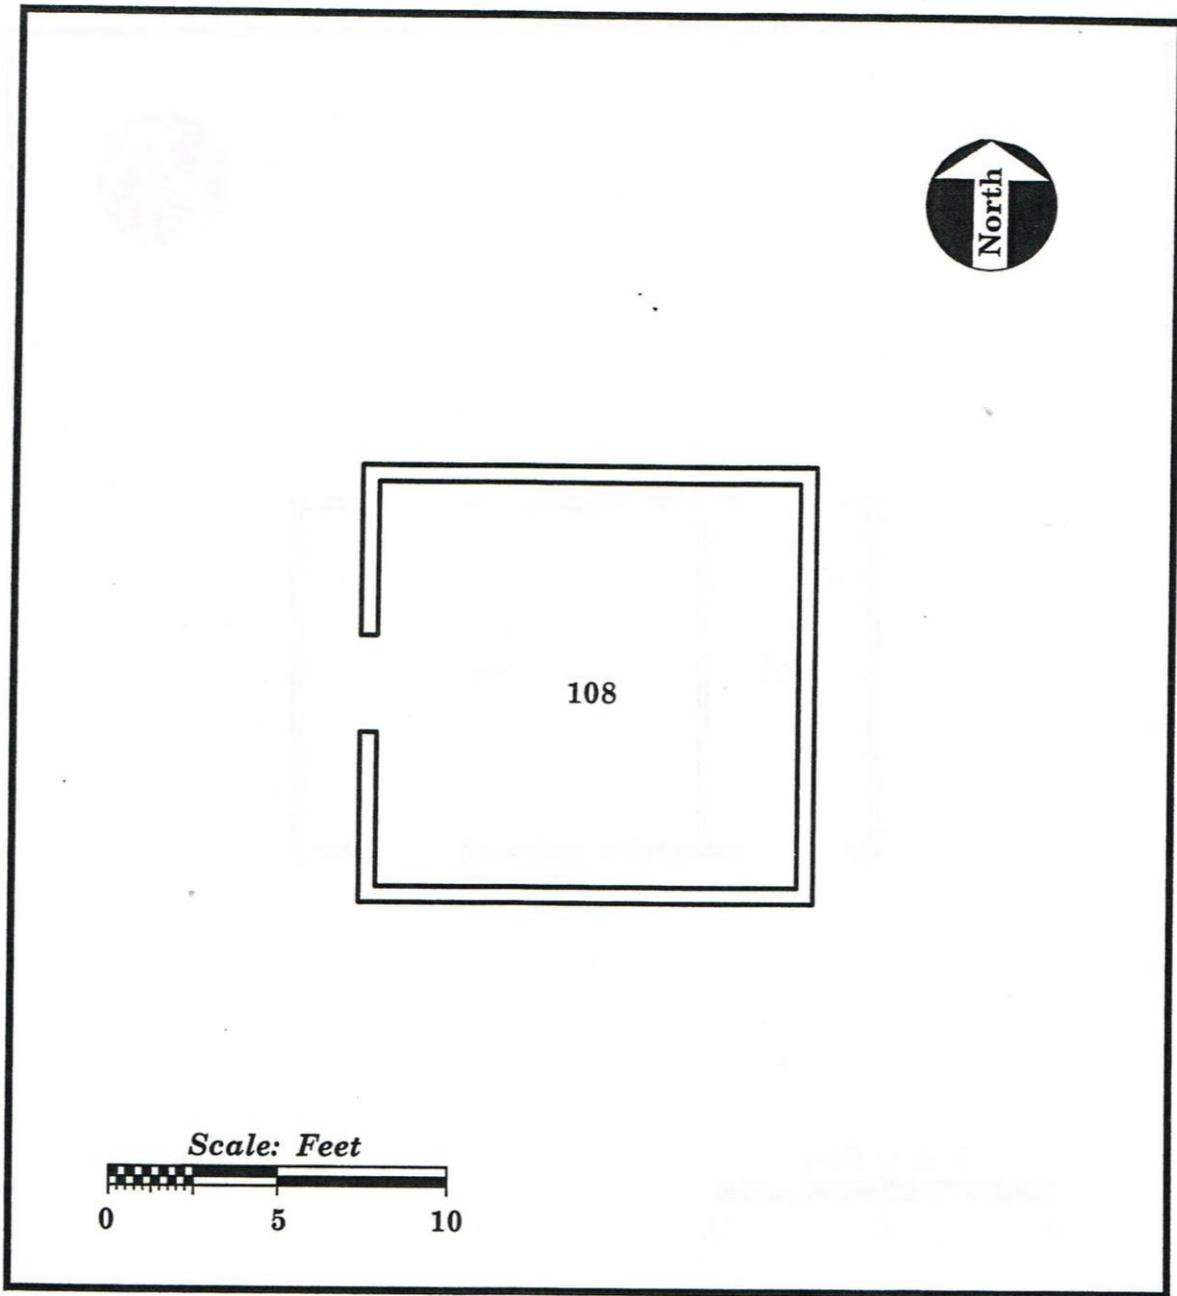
Building 817E, Facility Plot Plan, 1997, LLNL Archives, (Figure A-14)
